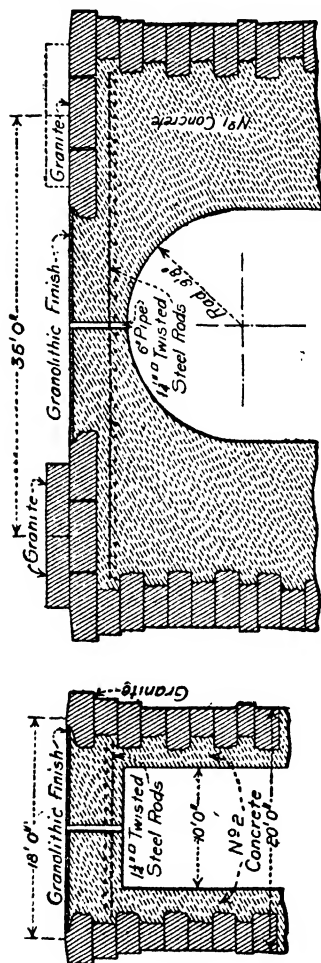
Chamber in Upper Part of Piers 2 and 3, Municipal Bridge.
